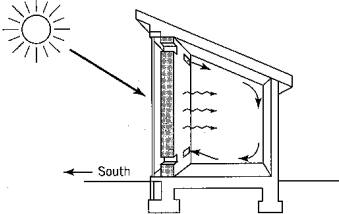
A typical Trombe wall installation. The massive concrete wall inside a glass window acts both as a collector and a heat storage medium. The room air circulates by natural convection as shown. Heat is also radiated by the wall into the living space. (Adapted from: J. Douglas Balcomb, *Passive Solar Space Heating*, Los Alamos National Laboratory, LA-UR-80-2555.)
